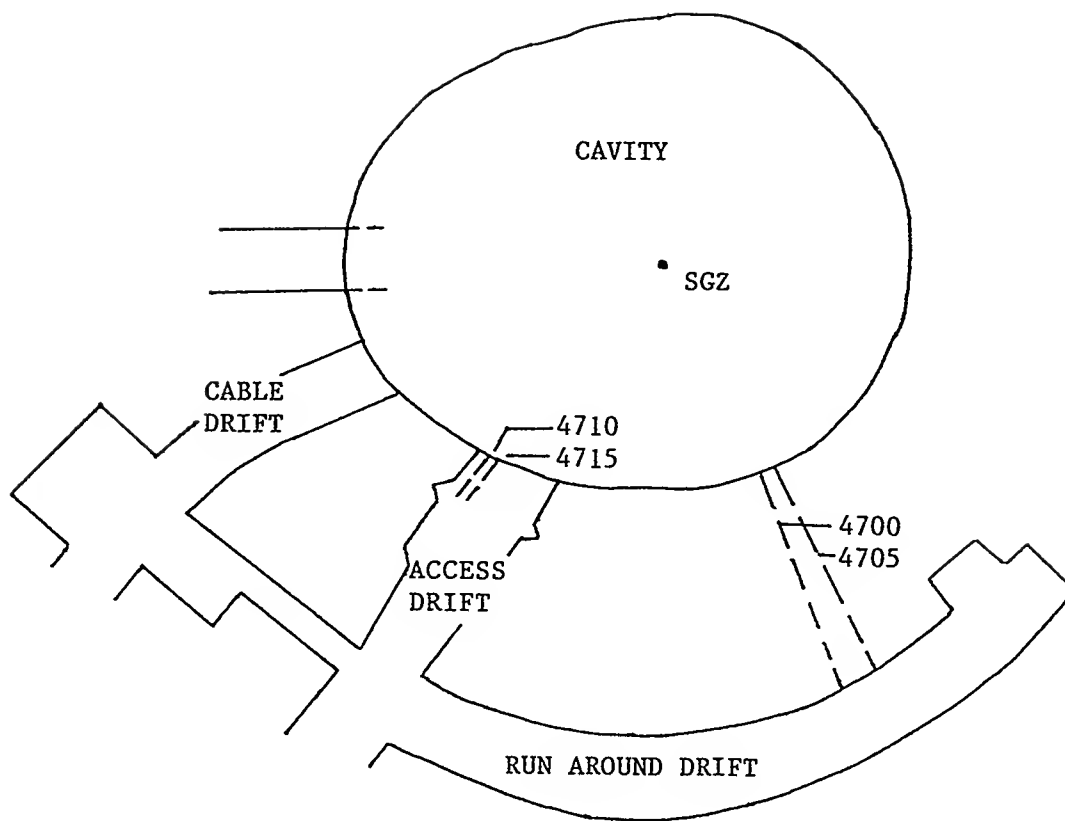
Plan View DIAMOND FORTUNE Cavity and Access Drifts
